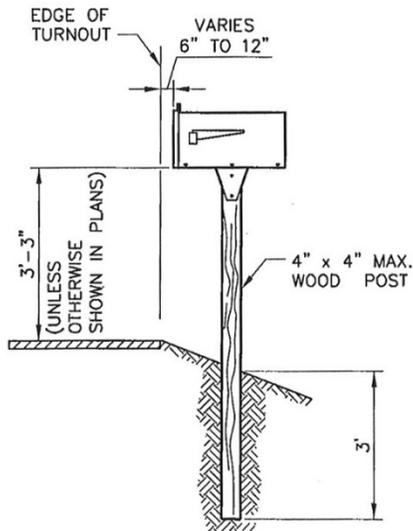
MAILBOX INSTALLATION TYPE 1 AND 2 (1 OF 4)
